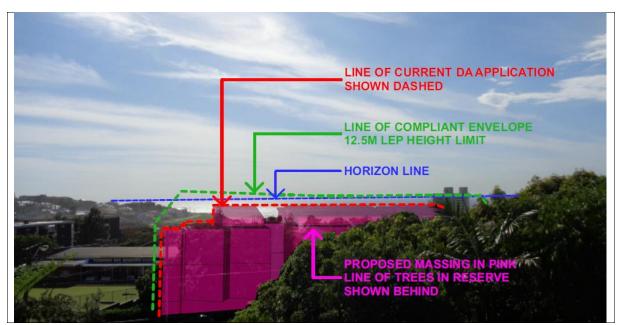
Photomontage of view analysis from a standing position on the front balcony of the existing dwelling house at 22 Clarendon Street, showing building massing of the approved development in pink (Source: MHNDU)
